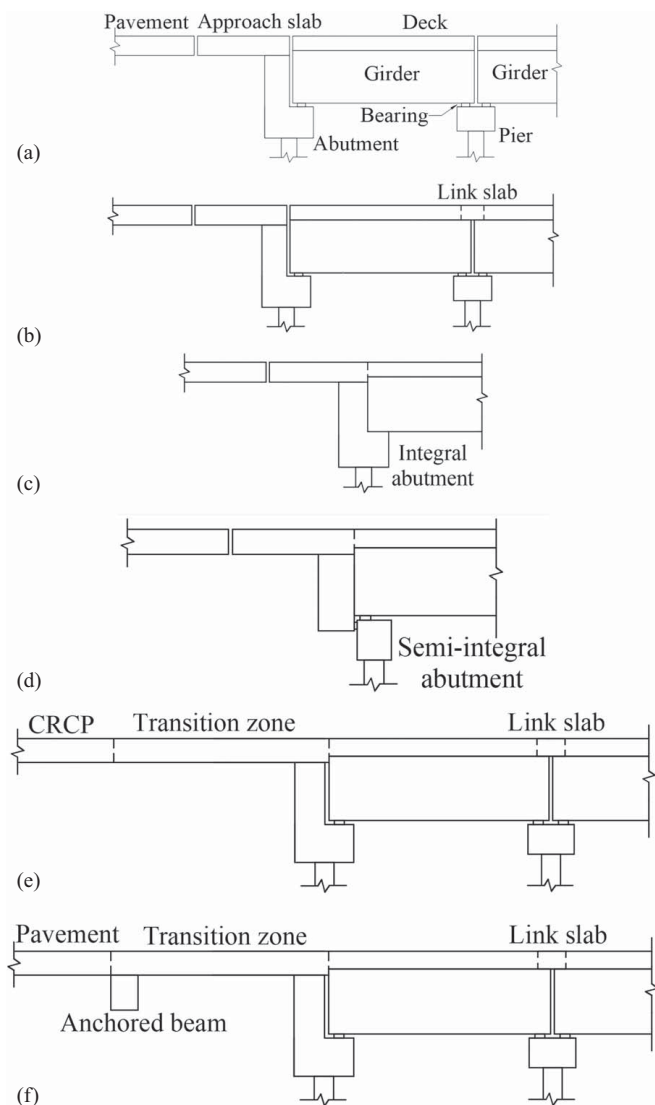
Bridge types: (a) conventional jointed bridge-pavement system; (b) jointless deck bridge; (c) integral bridge; (d) semi-integral bridge; (e) seamless bridge-CRCP system; and (f) seamless bridge-pavement system with an anchor.
